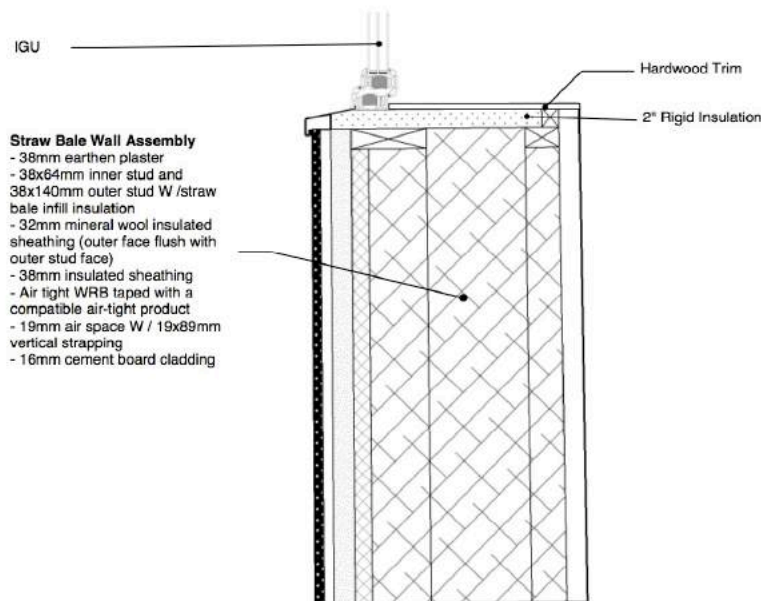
Head and Sill Window Detail (adapted from LVDesign, 2014).
